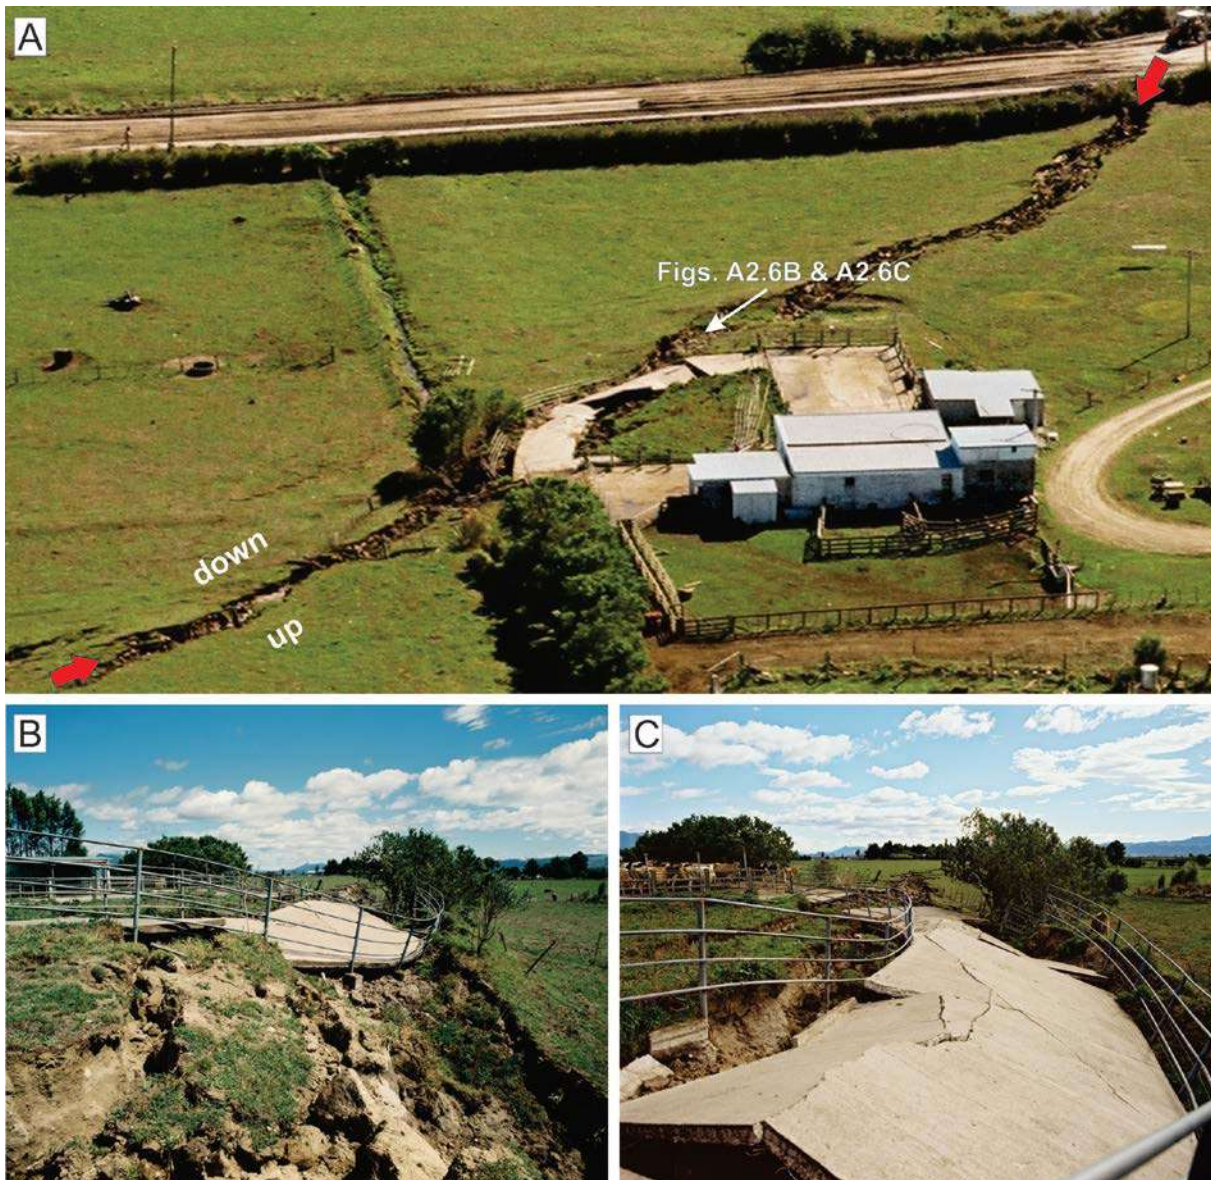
Edgcumbe Fault ground-surface rupture (red arrows) and damage to concrete race of milking shed south of McCracken Road, 1987 Edgcumbe earthquake. (A) Oblique aerial view looking northeast. See Figure A2.3B for location. (B, C) Details of reinforced concrete milking shed race damaged by metre-scale normal fault rupture. Views looking west-southwest. Photos by Lloyd Homer.
